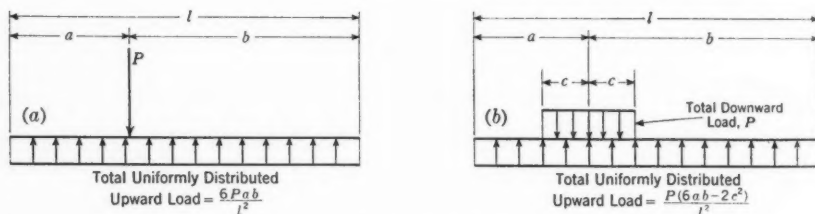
TWO EXAMPLES OF ORTHOSTATIC LOADS ON SUSPENSION BRIDGE
